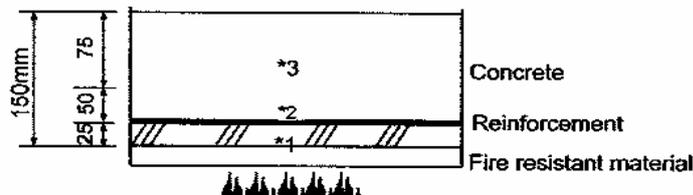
Schematic Cross Section of Concrete Member With Fire^[62, Bundesrepublik Deutschland]
